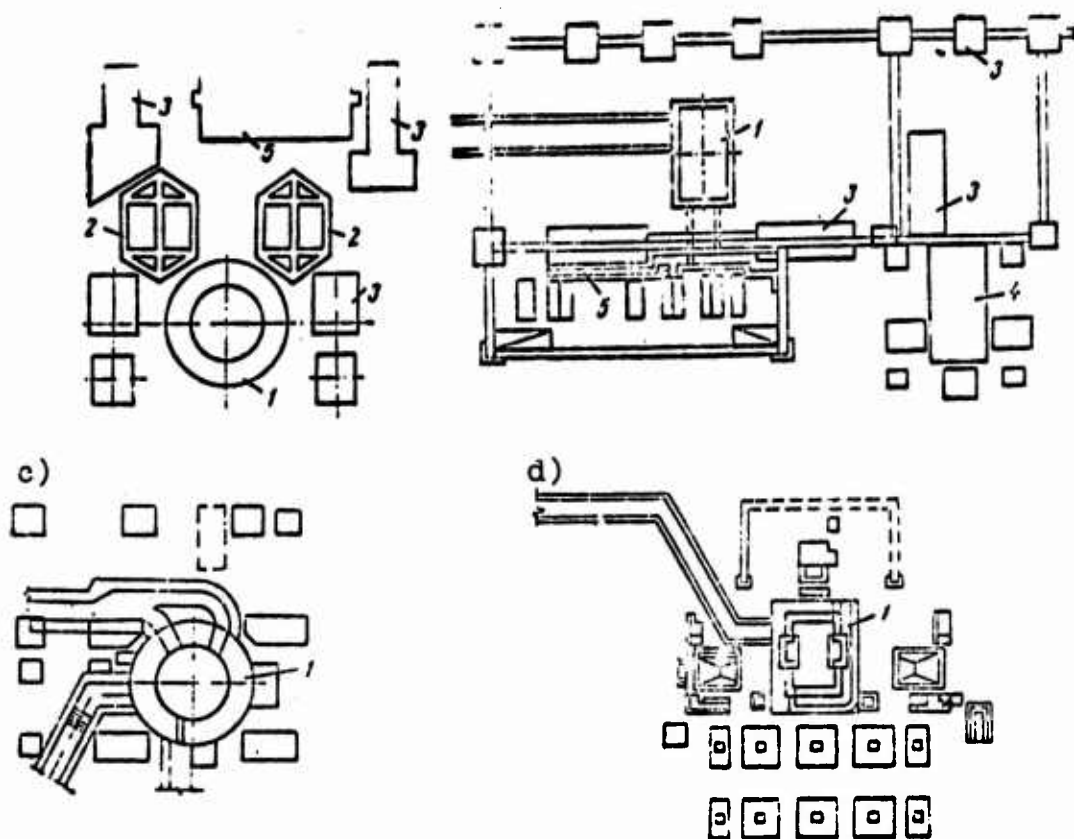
The units of the foundations, positioned abutting against mine shafts: 1 shoring - mouth; 2 - caissons - the artificial foundations of the hoppers; 3 - the foundations of hauling galleries and of a deckhouse building; 4 - the foundation of a crushing mill; 5 - the receiving funnel of the crushing-dressing mill.
